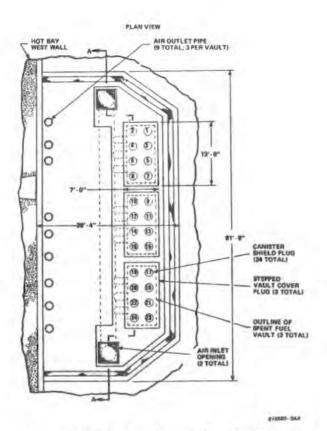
Lag Storage Pit Plan View at Floor Level
